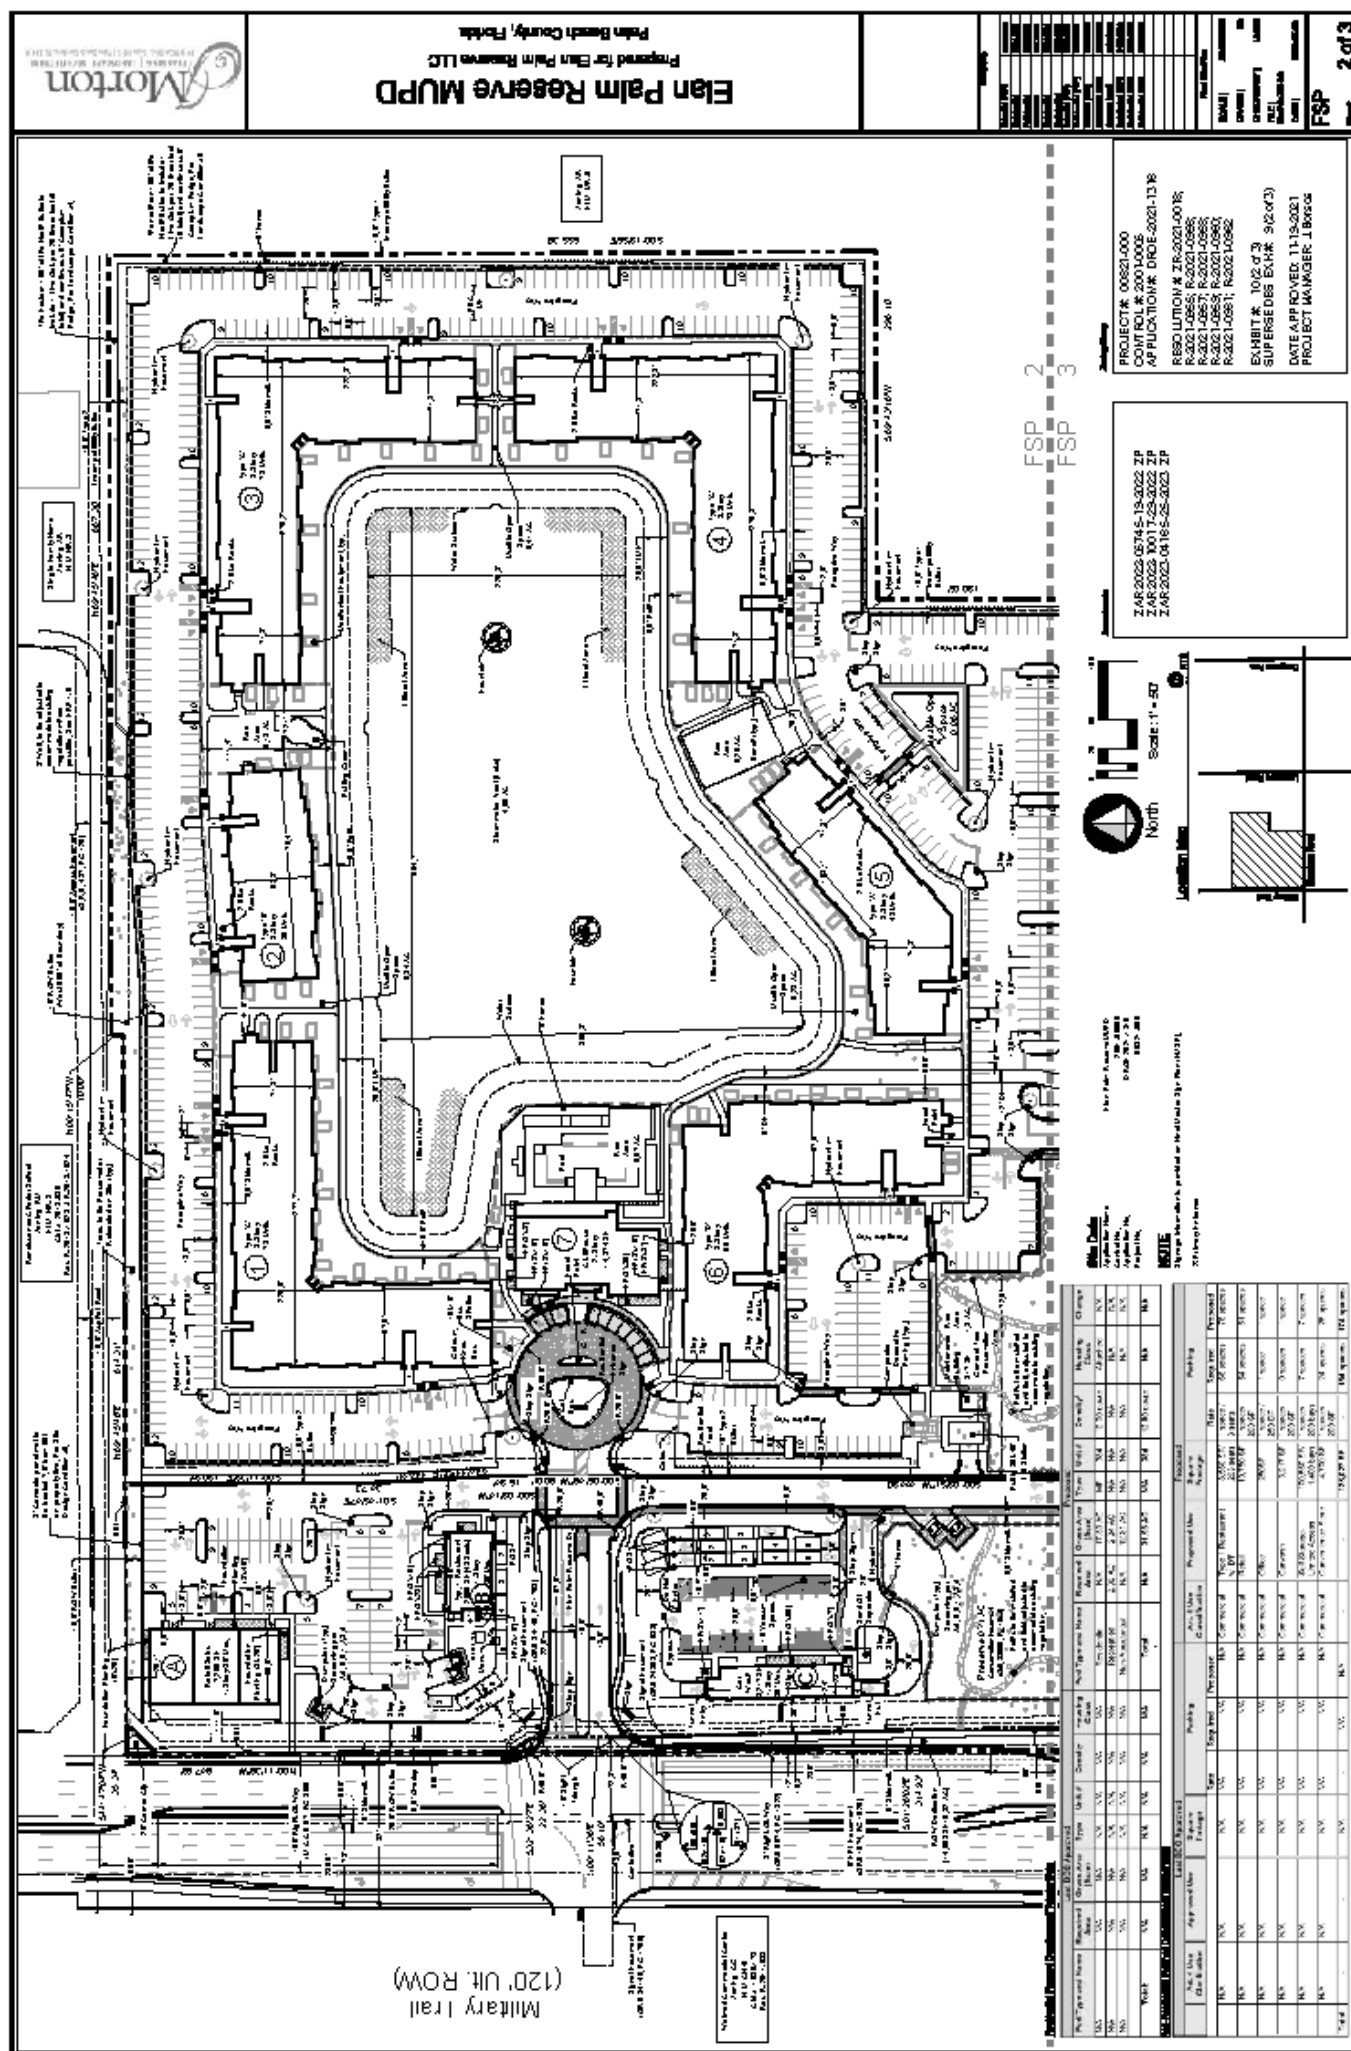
Aprproved Final Site Plan dated May 25, 2023 (page 3 of 3)
